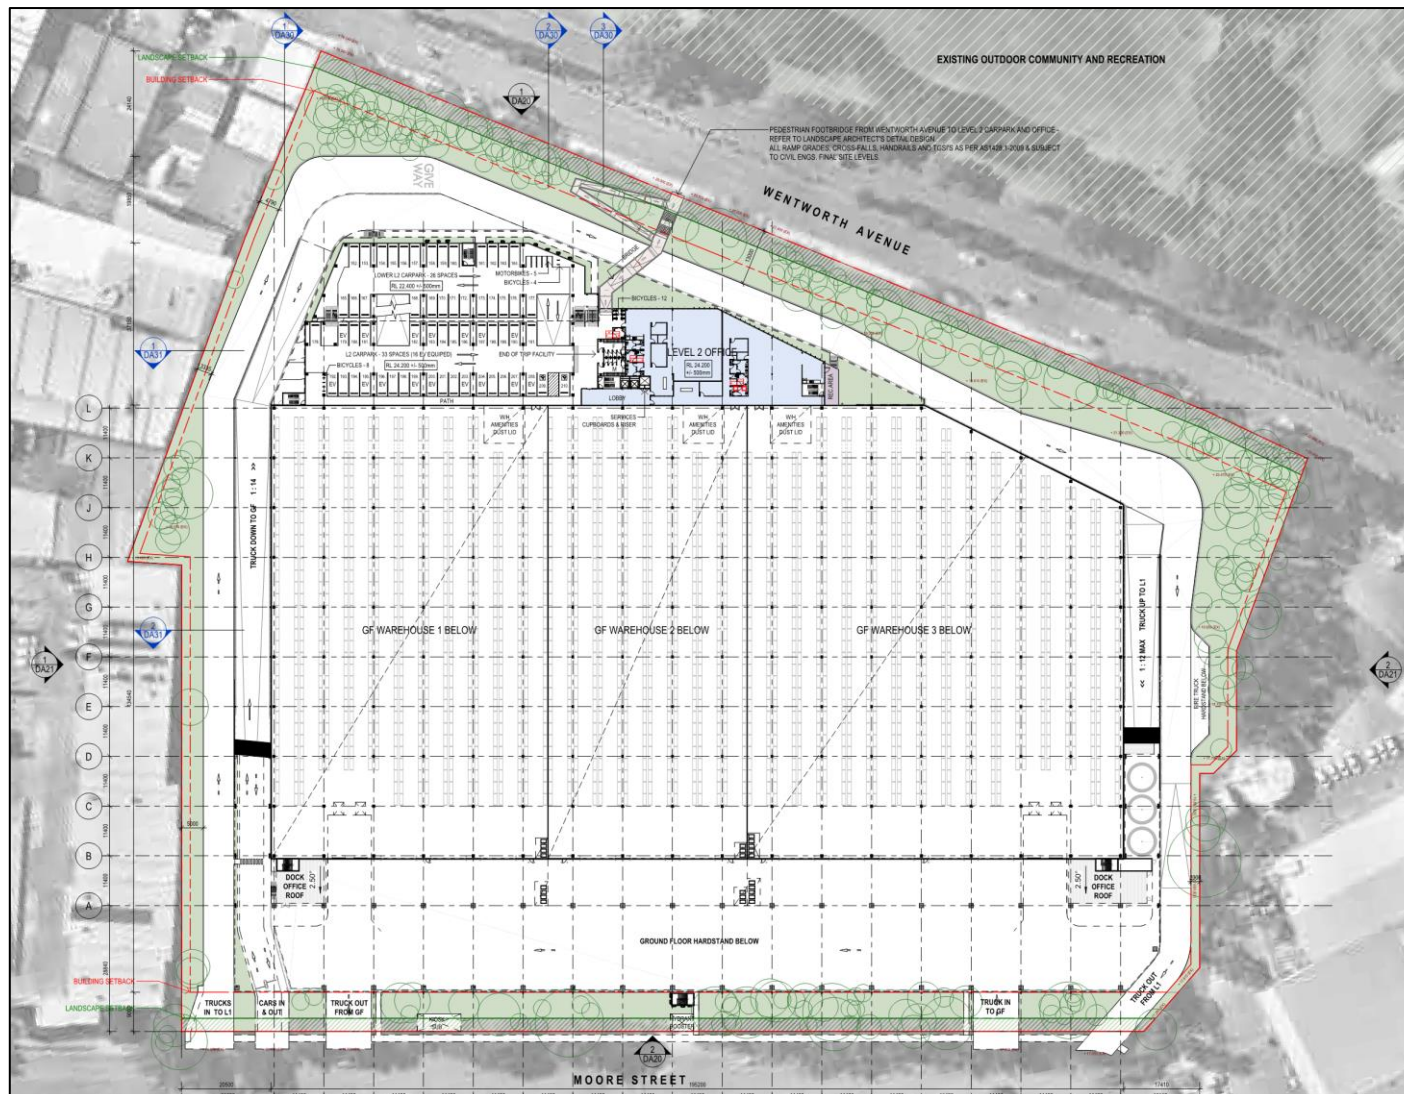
Level 2 Floor Plan (Nettletontribe Architects, 2024)
